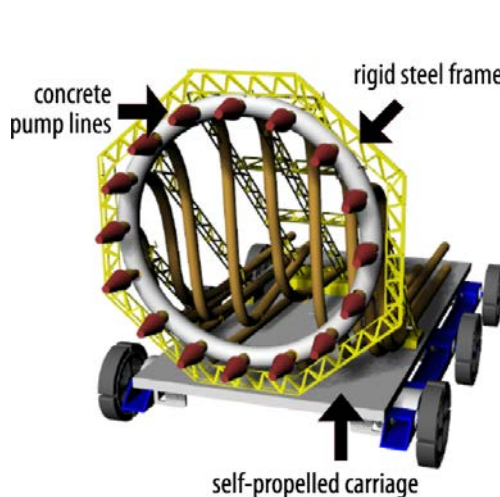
Concrete Crown concept with 16 concreting pump-lines
